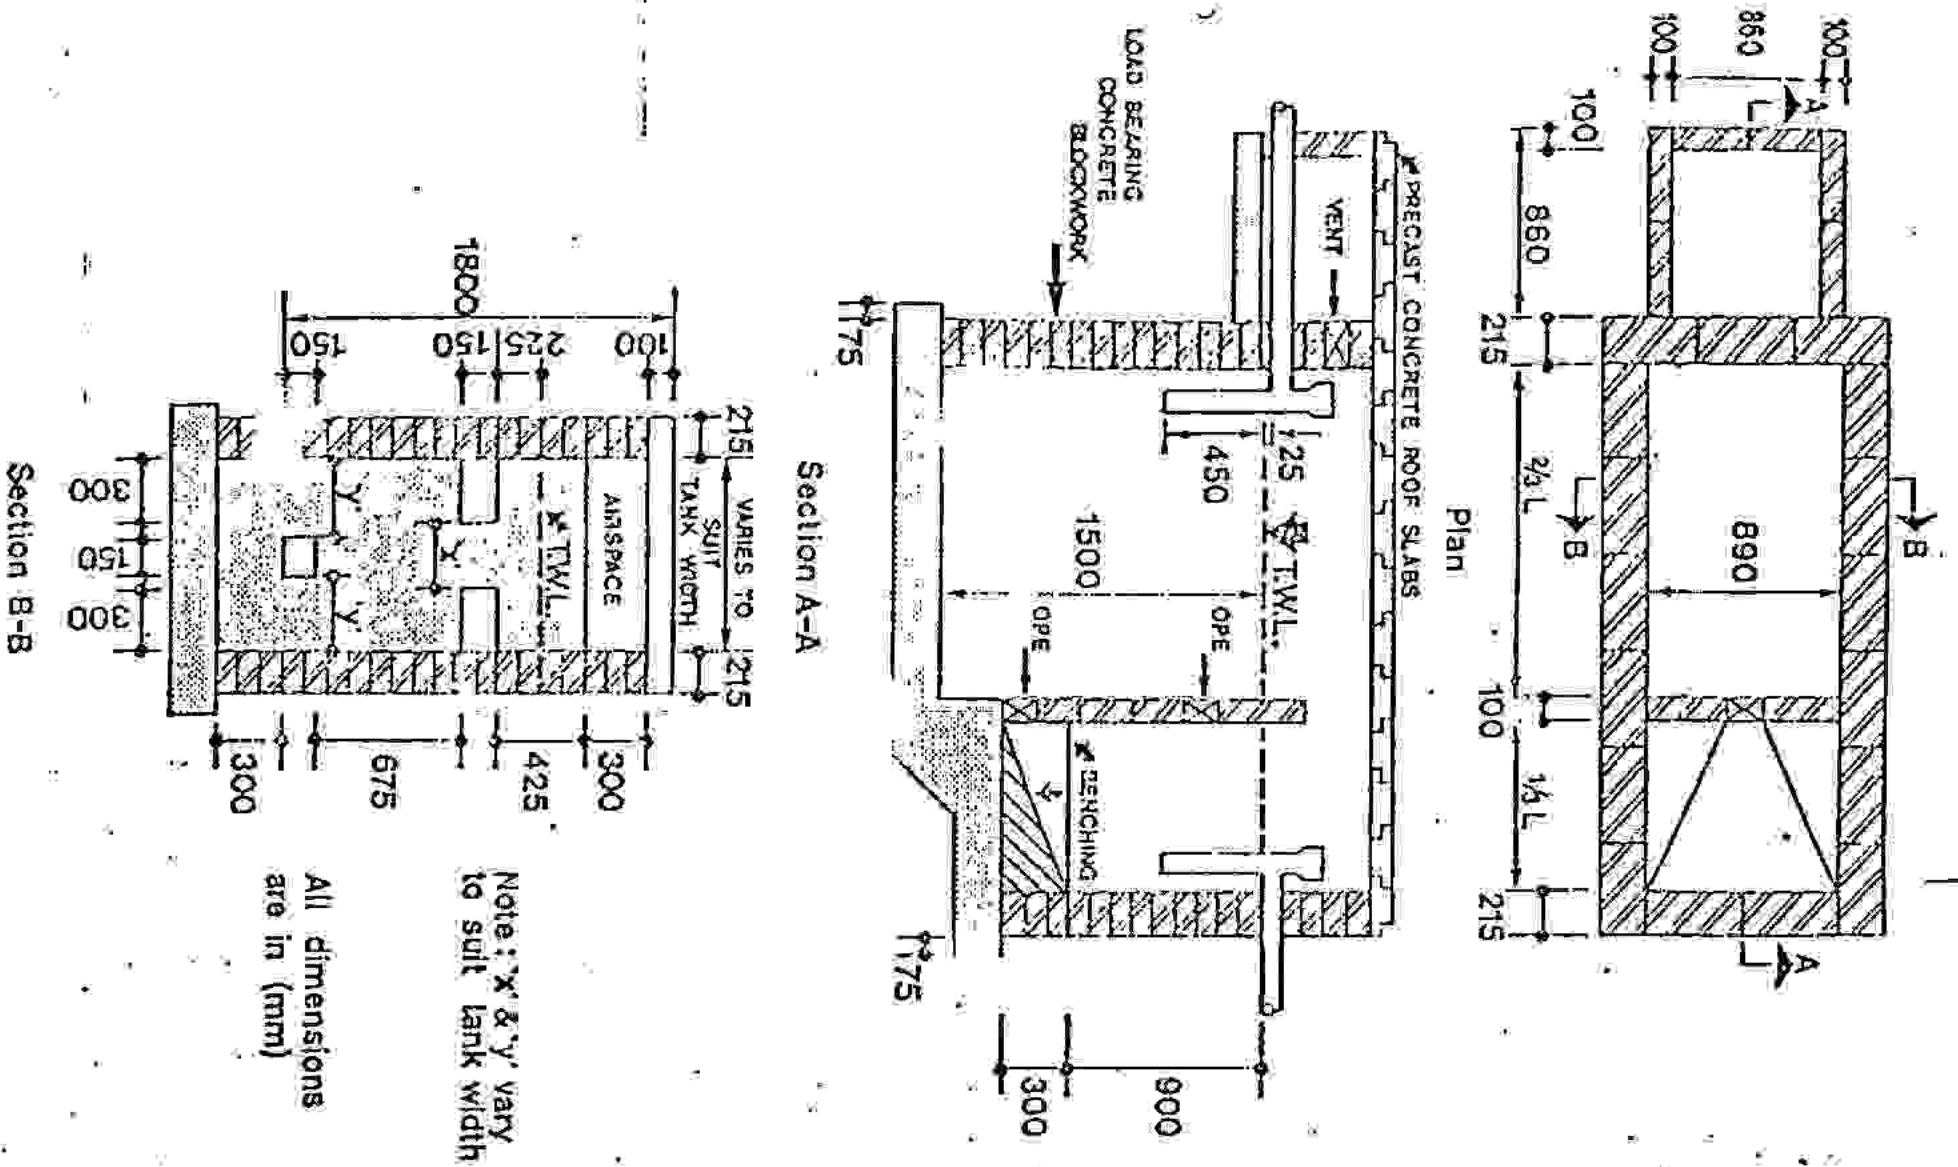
DETAILS OF CONCRETE BLOCK SEPTIC TANK
